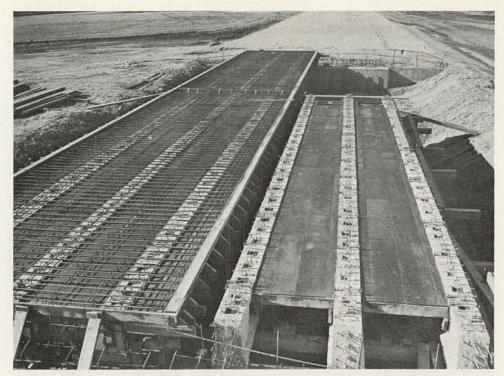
Prestressed concrete beam bridges showing slab reinforcement, recessed keys and extended stirrups.
